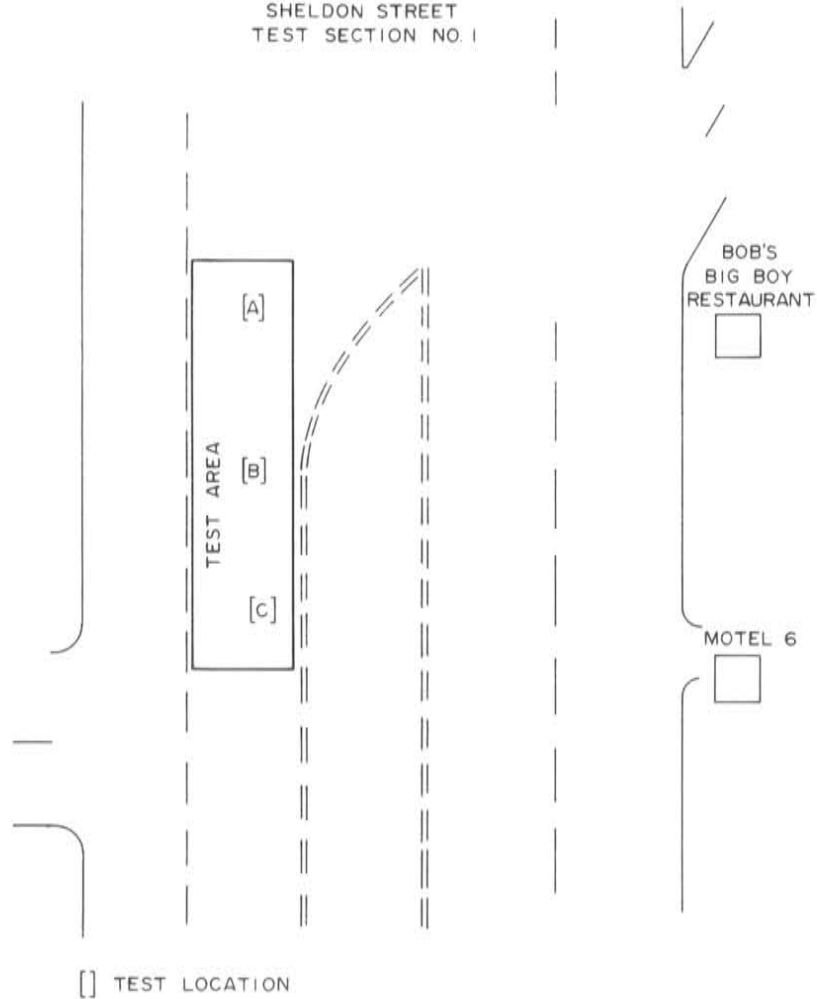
LOCATION OF TEST SECTION, SHELDON STREET #1
